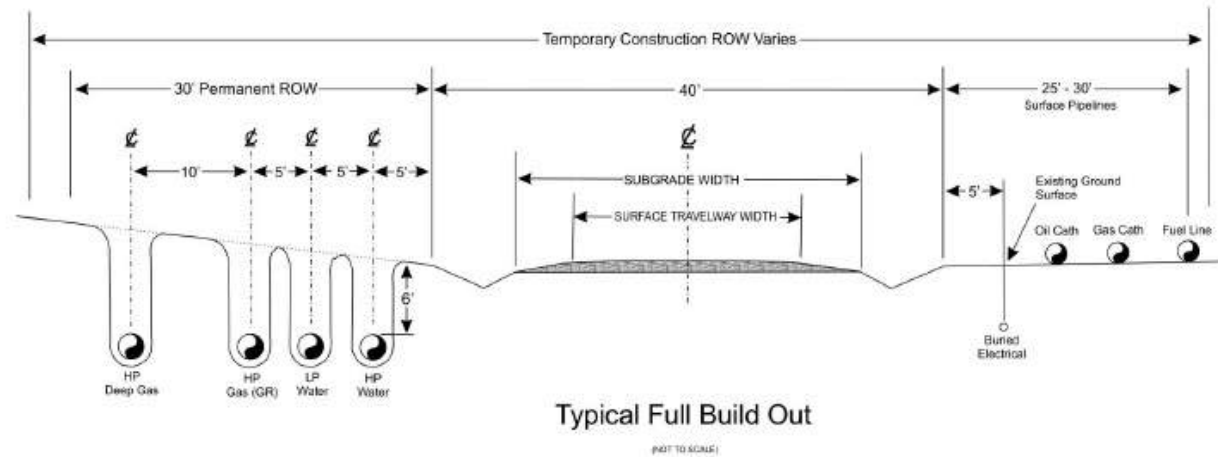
Typical Roadway Cross-section with Pipeline Installation Along Side Road.
